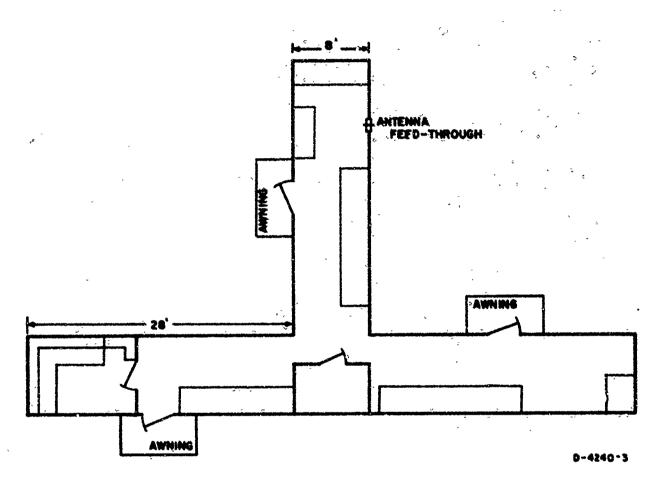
GENERAL LAYOUT OF MRDC LAPORATORY T-VAN COMPLEX
